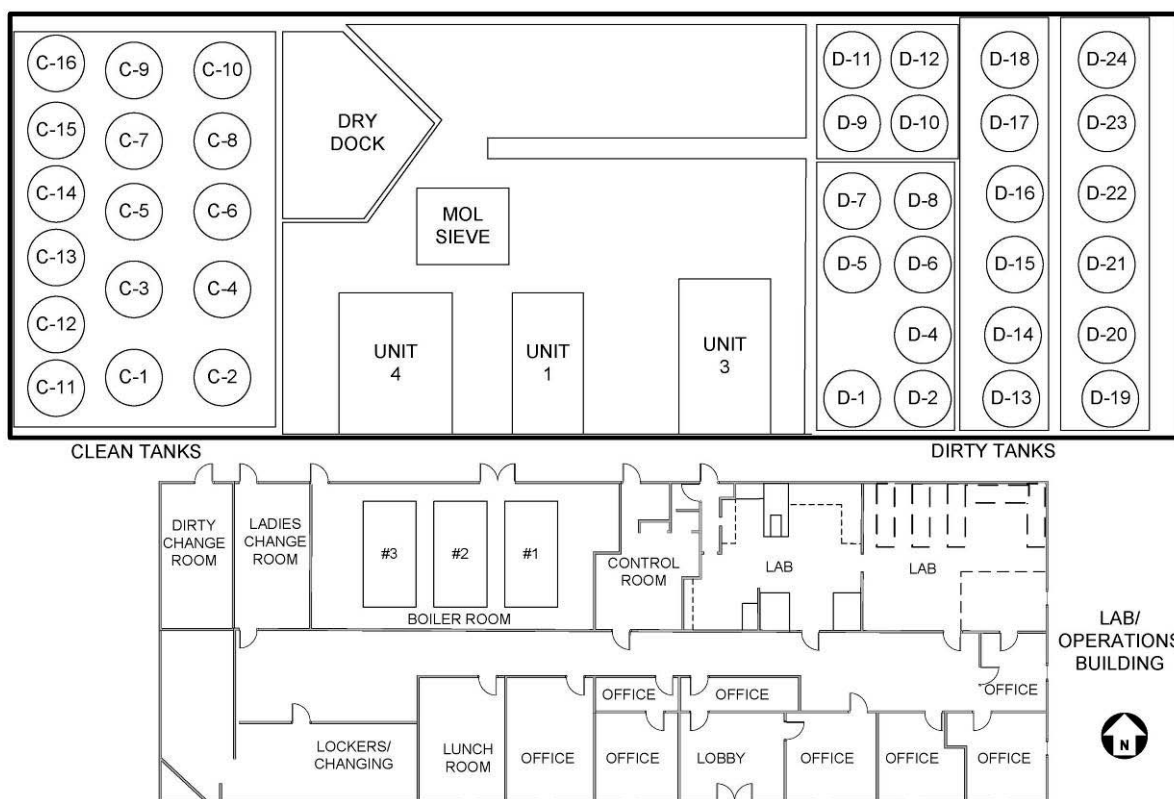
Plot plan of Units 1, 3, and 4; clean and dirty tanks; and the lab/operations building (not to scale)
